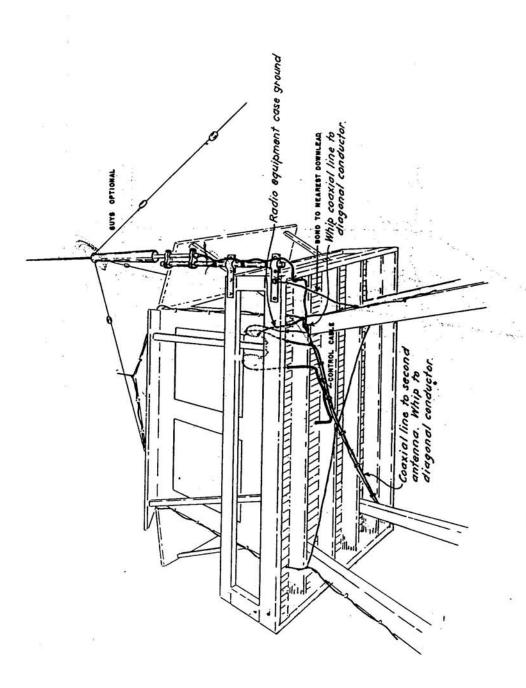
Typical layout of diagonal conductors under cab floor.
